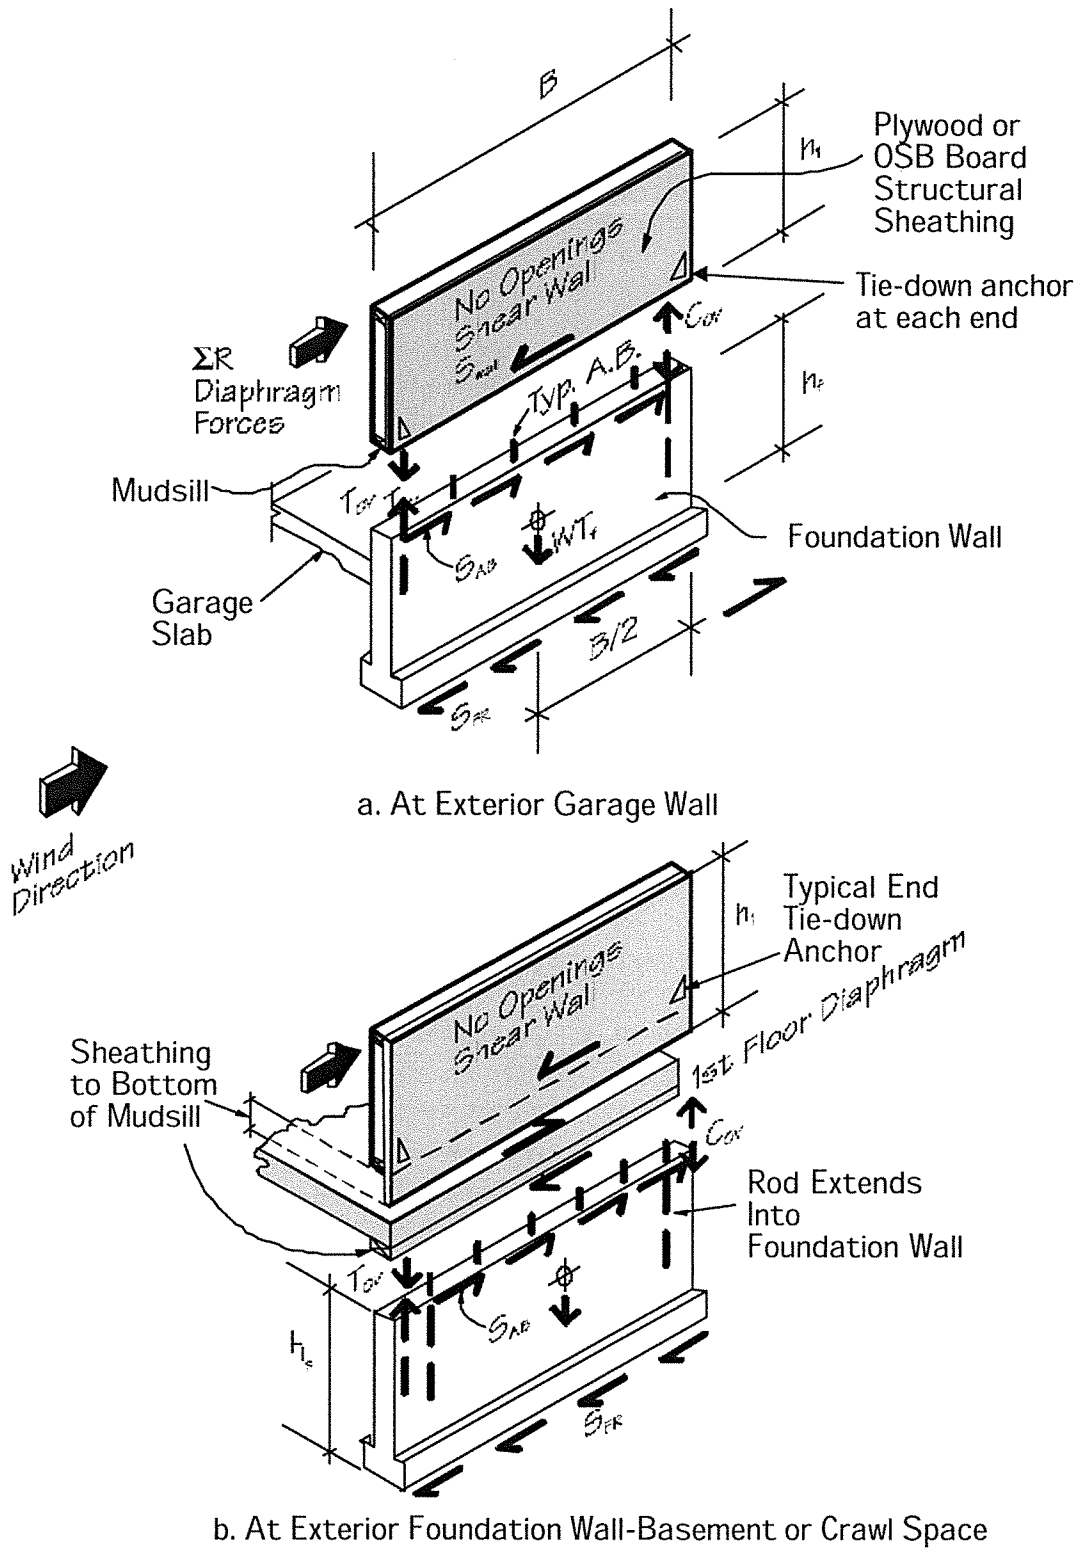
Concept 1-Foundation Wall Below Shear Wall
